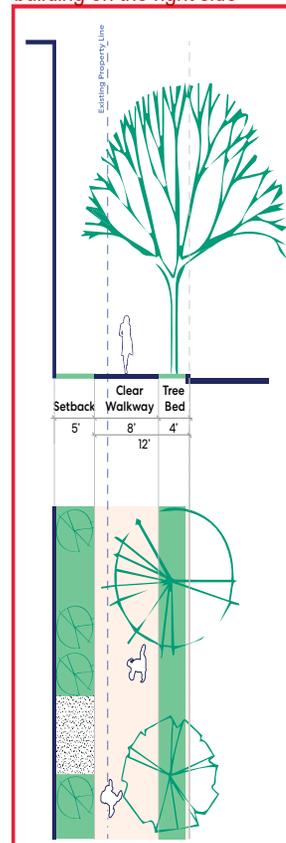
Typical Page Mill Road Sidewalk Zone Section
